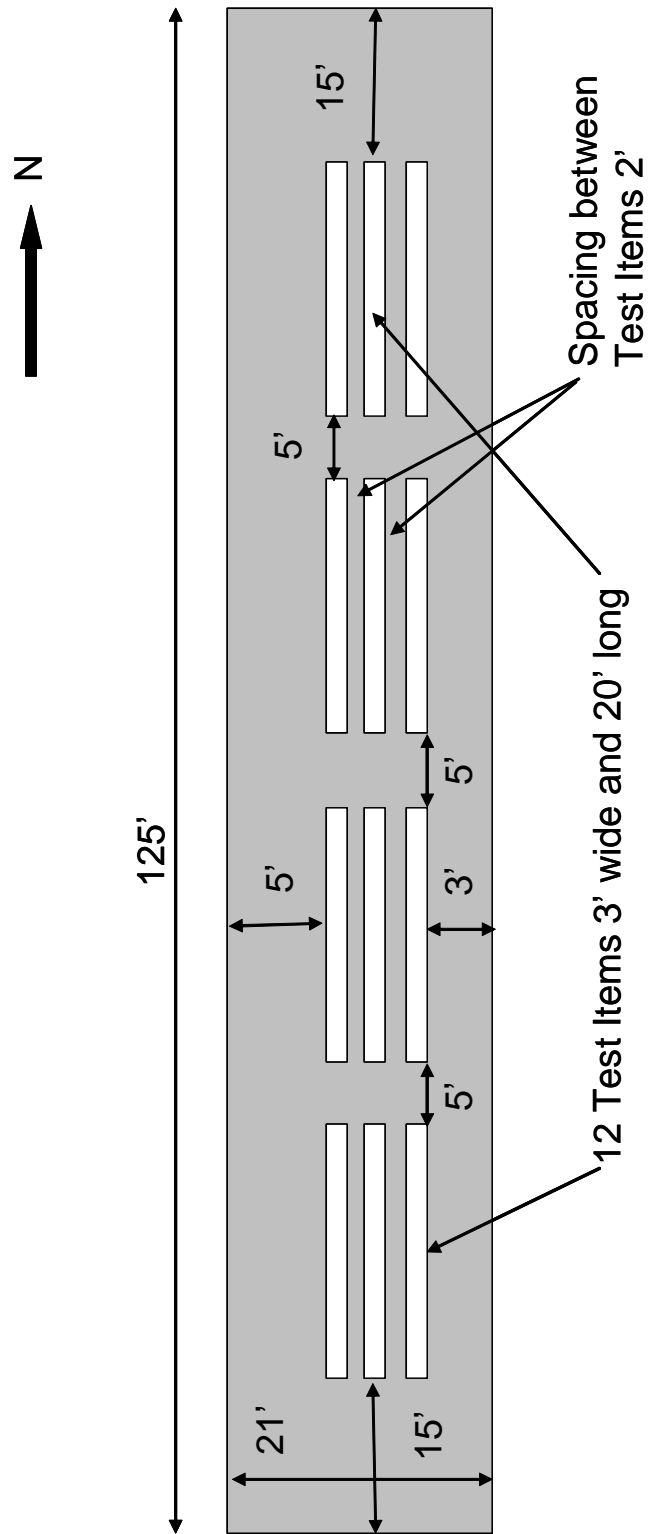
Layout of Test Items within FERG Test Section.
